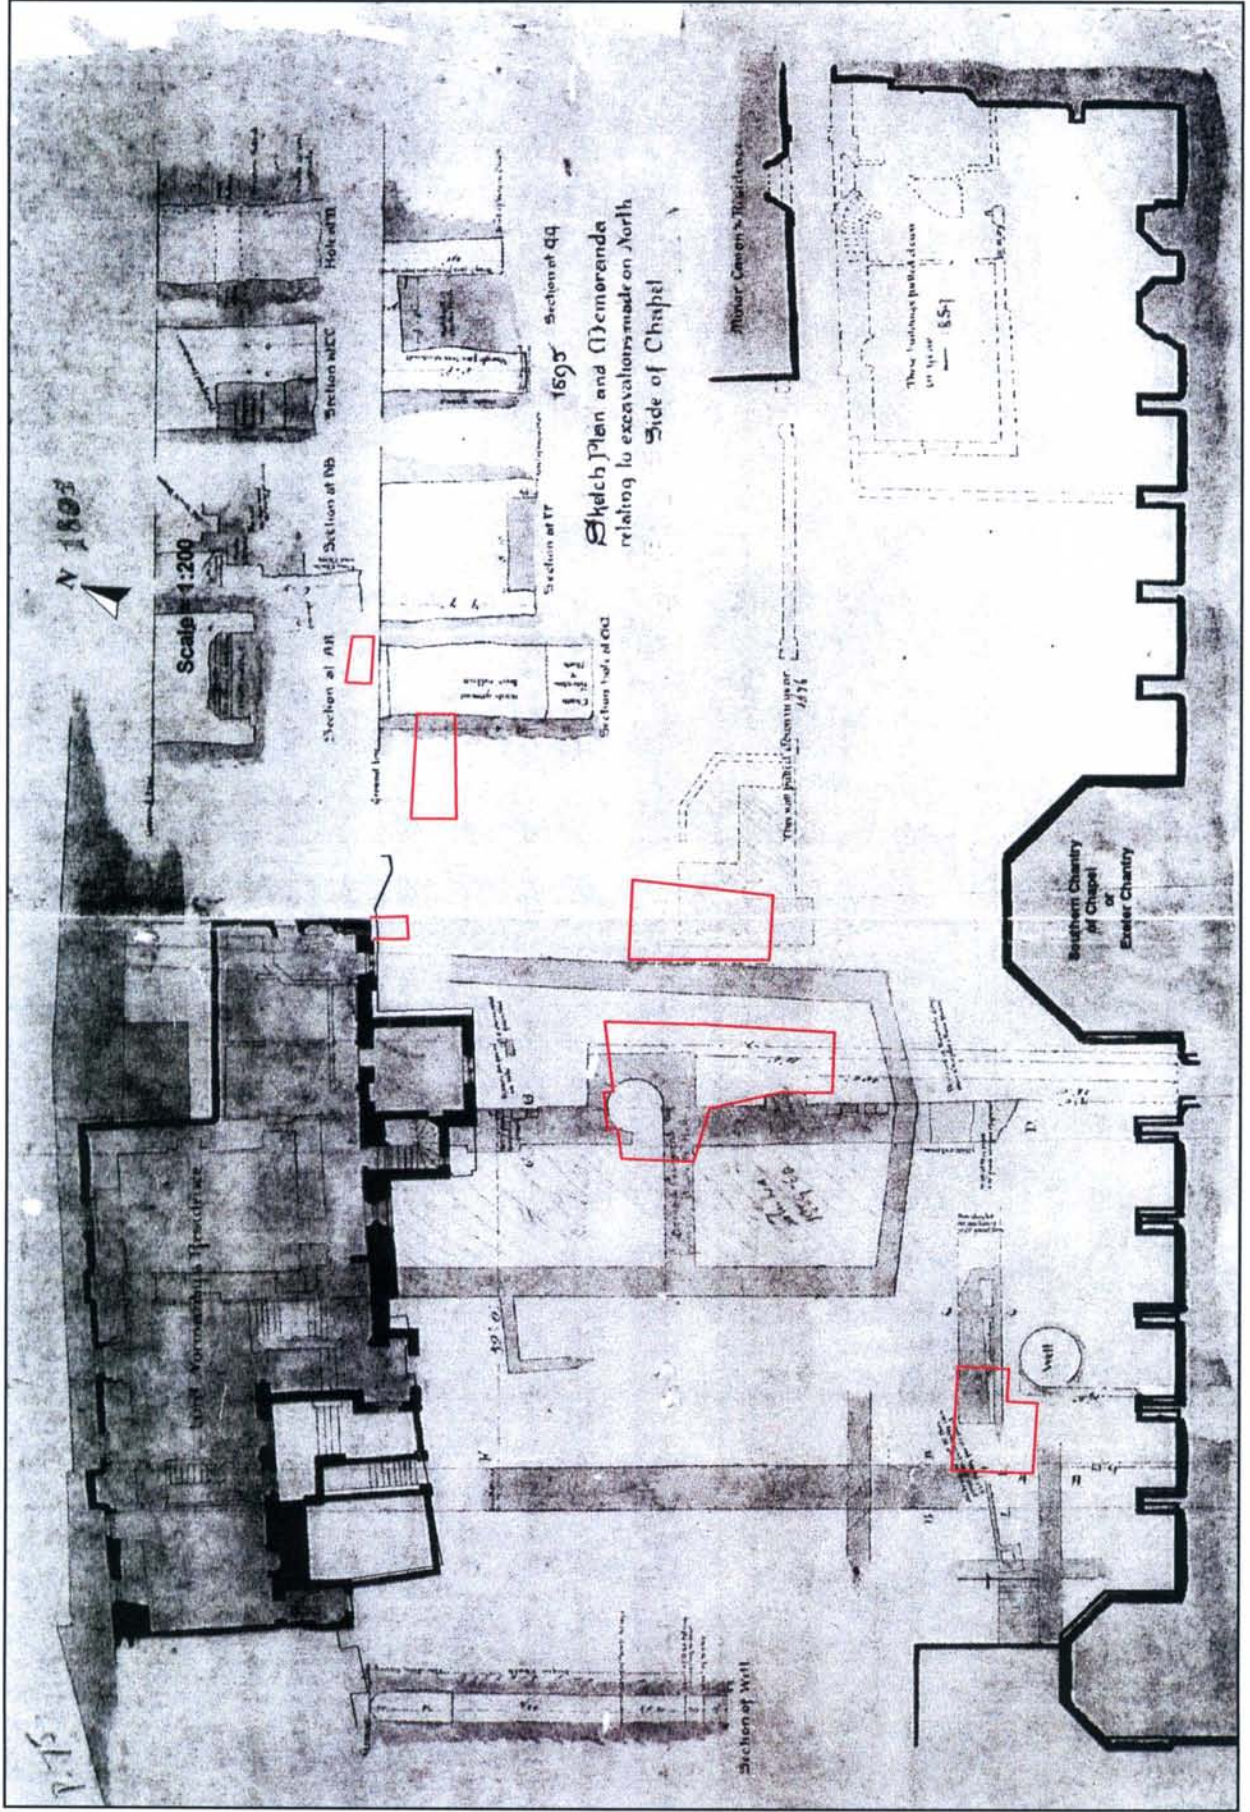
Windsor Castle: Hope's ground plan of Denton's Commons c. 1895 with trench locations outlined in red.
